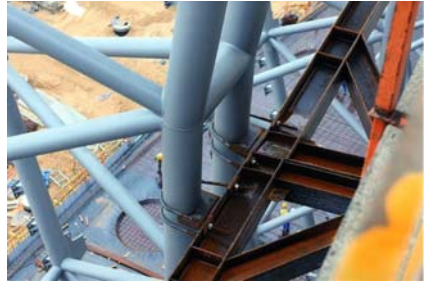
Bars of a roof girder lower belt connected temporarily with stirrup bolts to the steel ring on the stadium stand reinforced concrete crown beam
